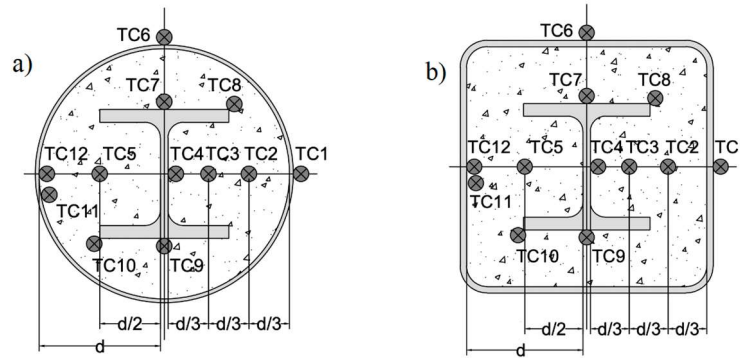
Thermocouple layout of the post-fire tests: a) circular sections; b) square sections.
